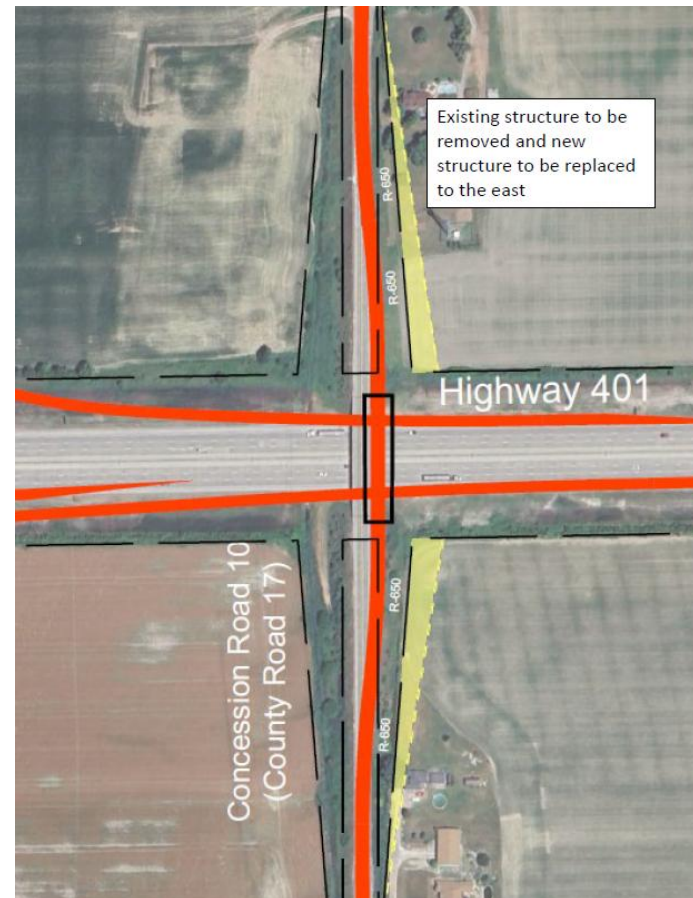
Alternative 2 – East Bridge. Open with two lanes
